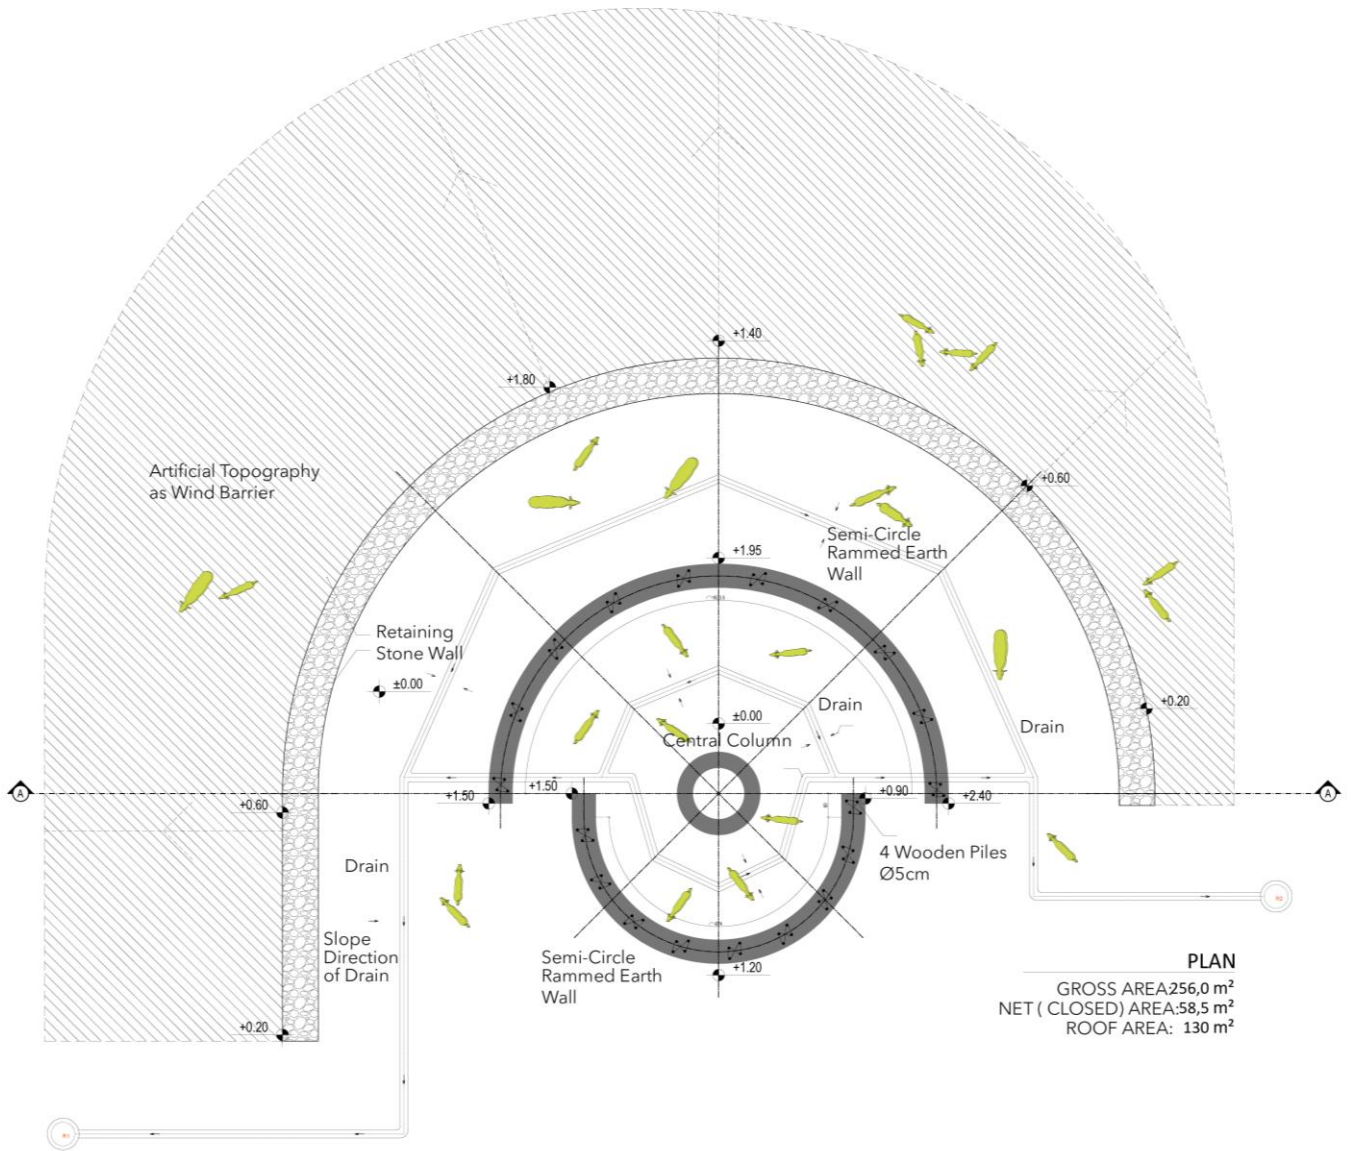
Floor Plan, *Dilara Demiralp, 2019
